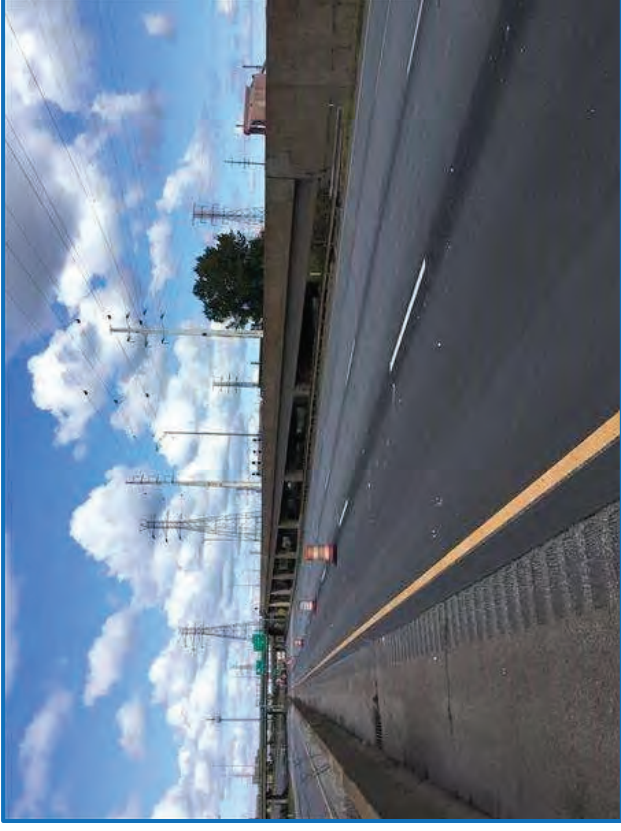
View along westbound SR 912 of Ramp I facing west (9/29/2020).
